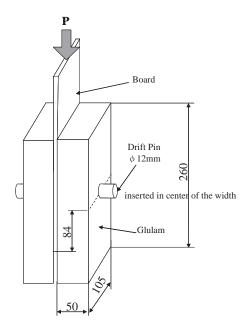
Dimensions of specimen used in shearing test between plate and side members with drift pin (Unit: mm).
